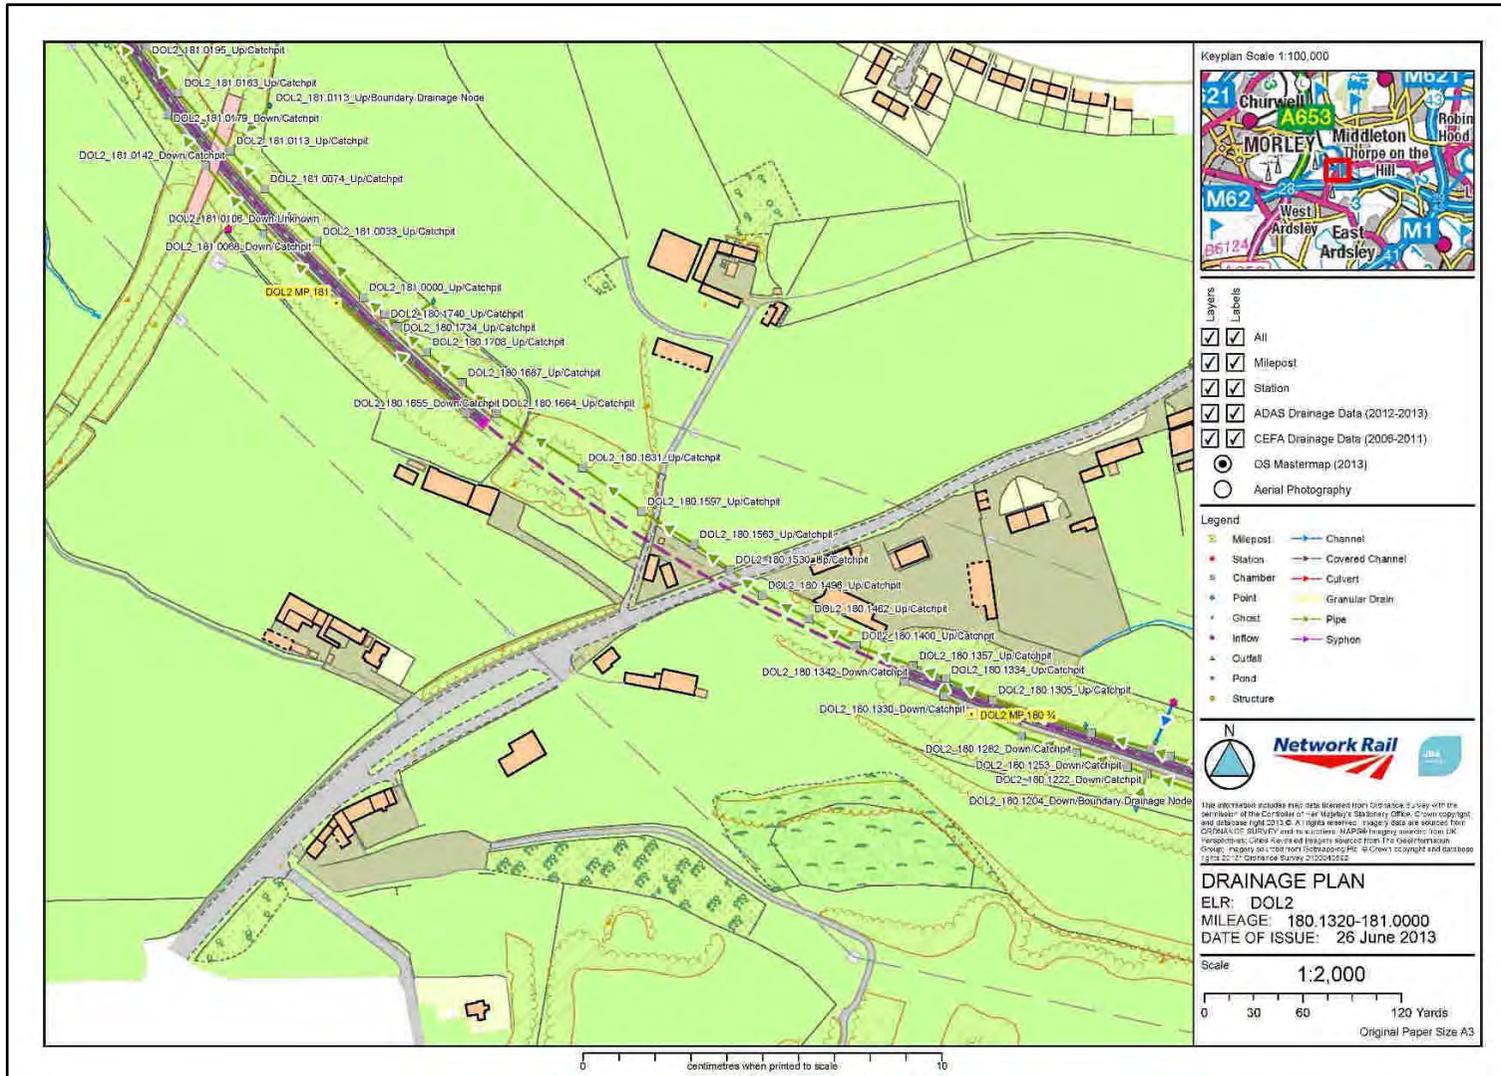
Map of drainage assets at Ardsley Tunnel site (Network Rail, 2013b)
